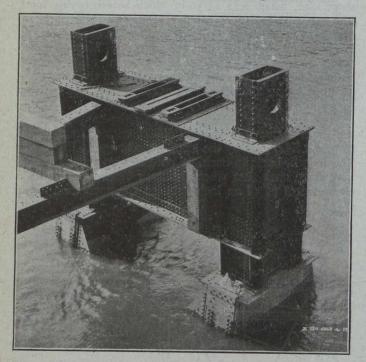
Lower Section of Bearings in Place on Lower Supporting Girder at Sillery
